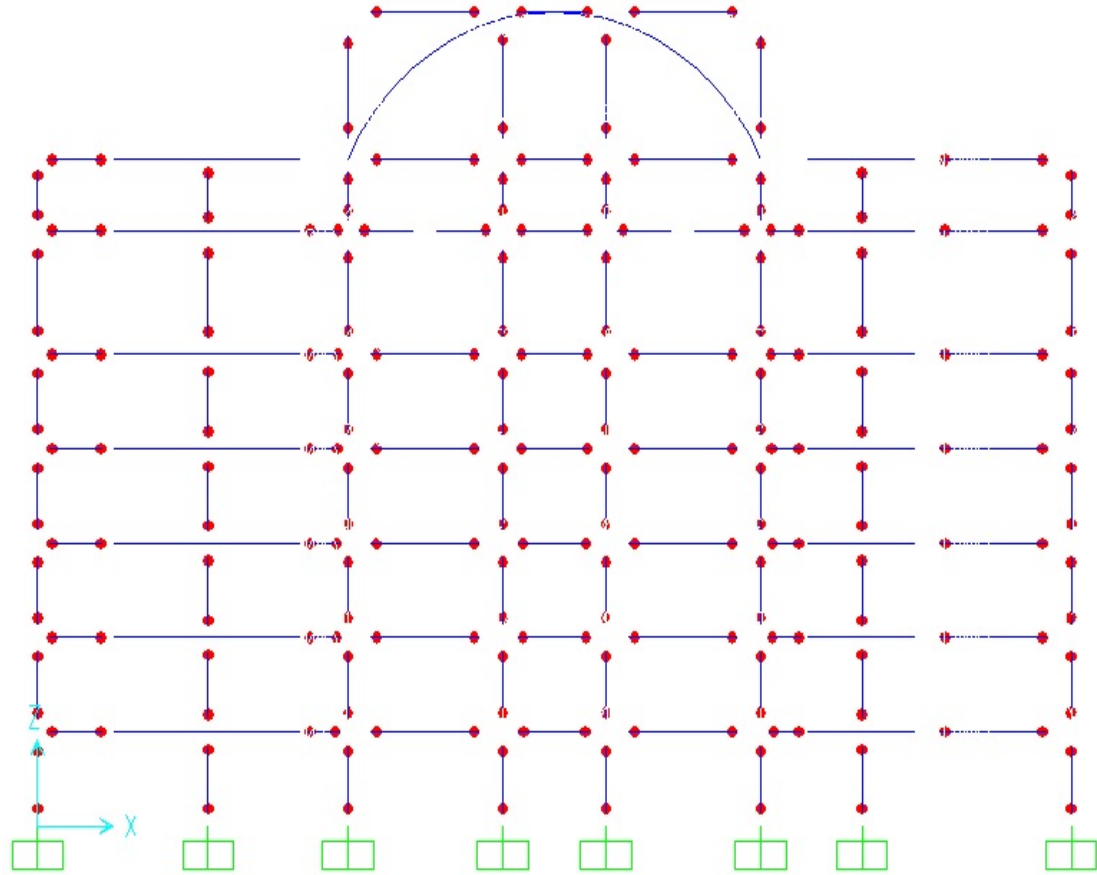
Plastic Hinges Defined At the Ends of Beams, Columns, and Shear Wall for Mid-Pier Model
